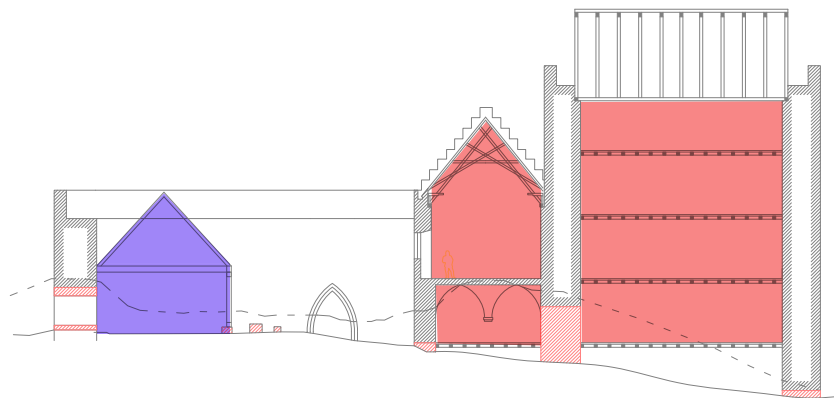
Speculative reconstruction with Hall building (red) and economic building (blue) 1:500. (A4)
